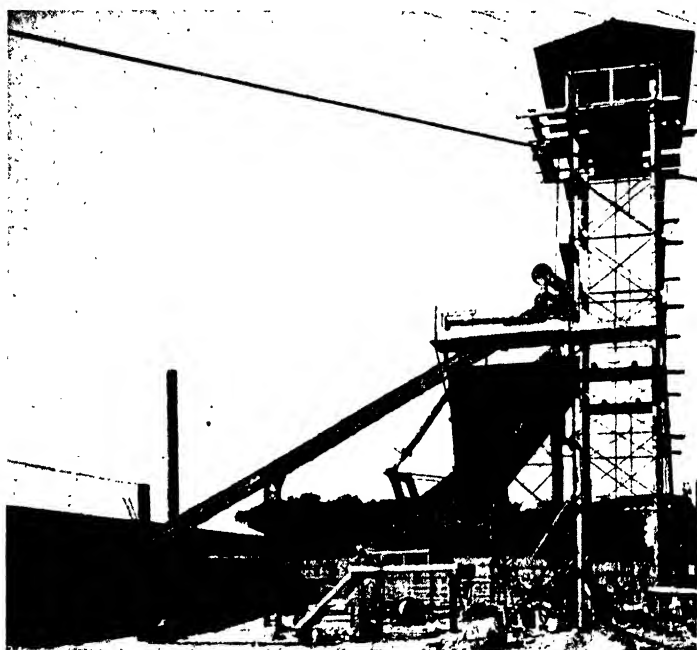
Tubular steel headframe on Montebello water tunnel, Baltimore. Hoist is in the building at extreme left. Note the inclined strut between hoist and headframe along the line of the cable, instead of the usual backstay tower bracing.
